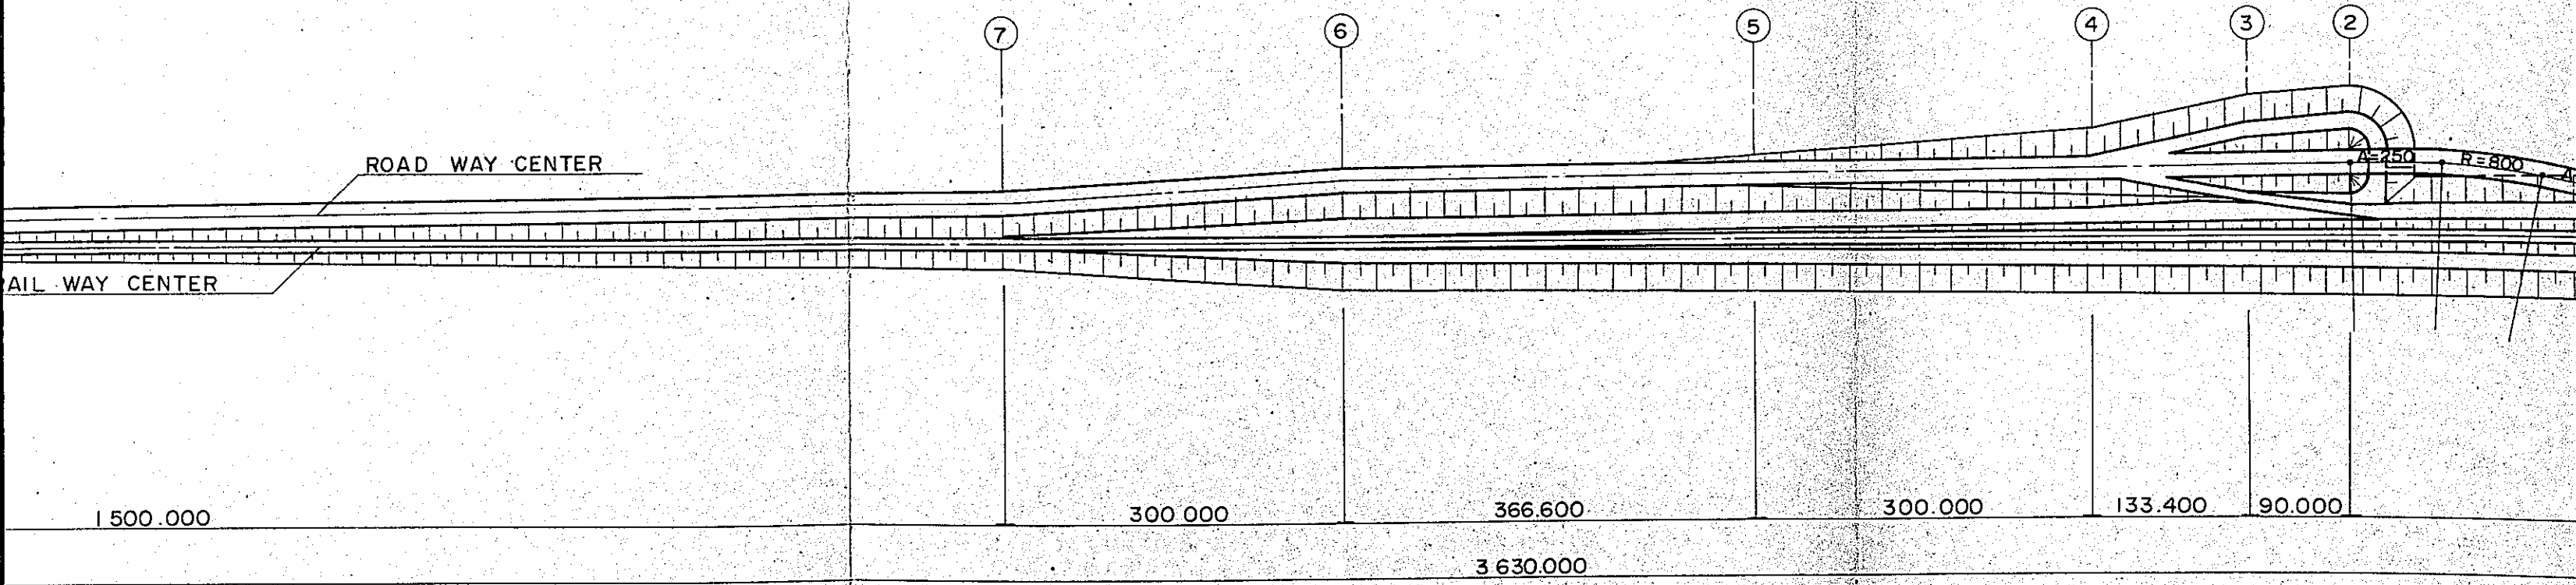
JAMUNA RIVER BRIDGE APPROACH (DOUBLE
